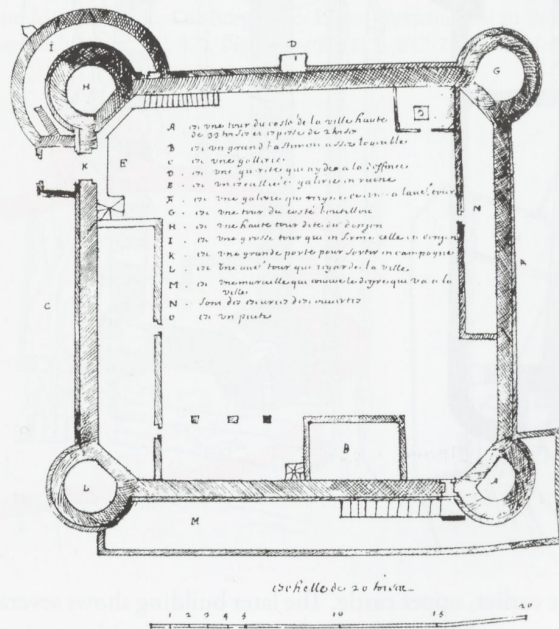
DELLE CASTLE (TERRITOIRE DE BELFORT), VANISHED CASTLE, PLAN FROM 1662 (R. WILL, LES CHÂTEAUX DE PLAN CARRÉ...)
